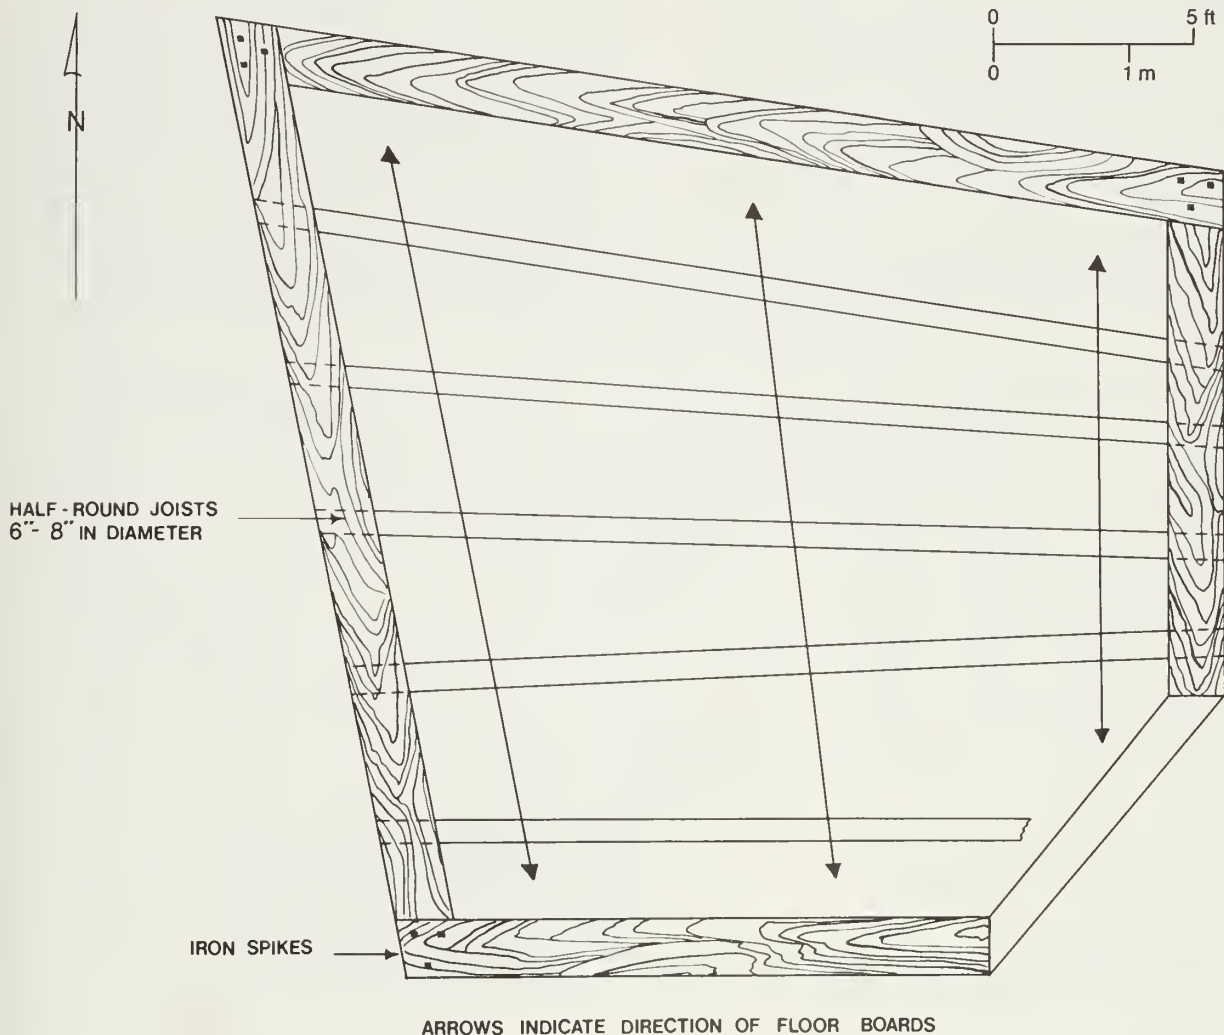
Ground plan, northwest flanker, Fort Albany.
